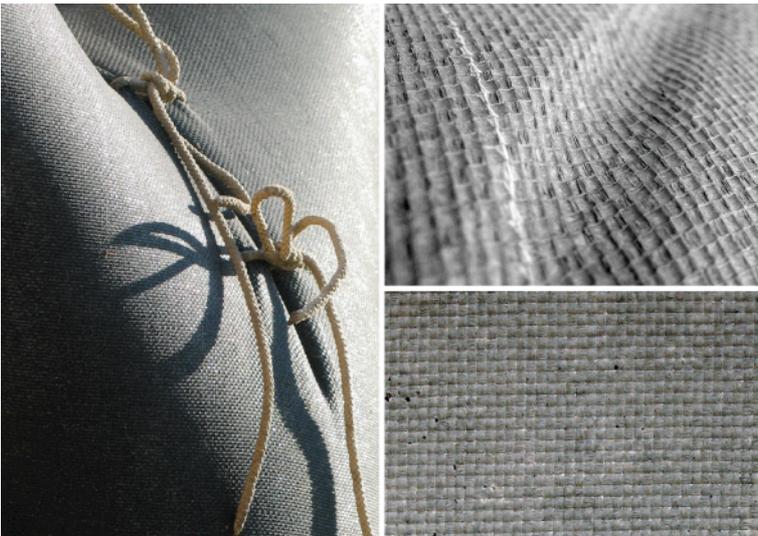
Visual concrete finish using fabric formwork (images courtesy CAST)
